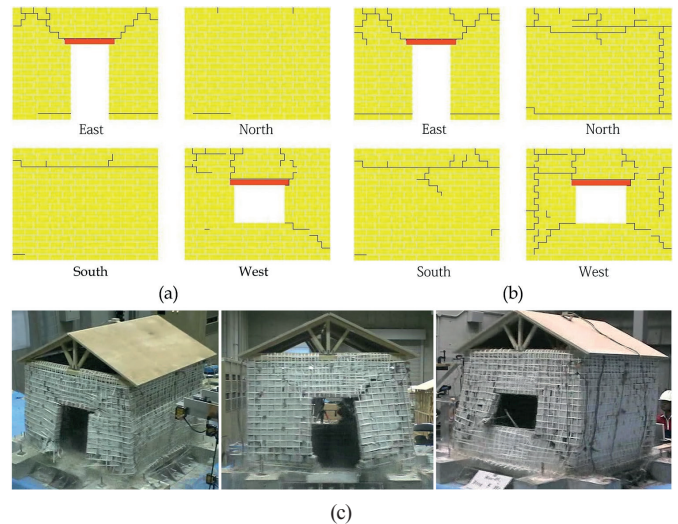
House model 2 at various levels (a) crack pattern at run 34 (b) crack pattern at run 40 and (c) damage level at run 49
